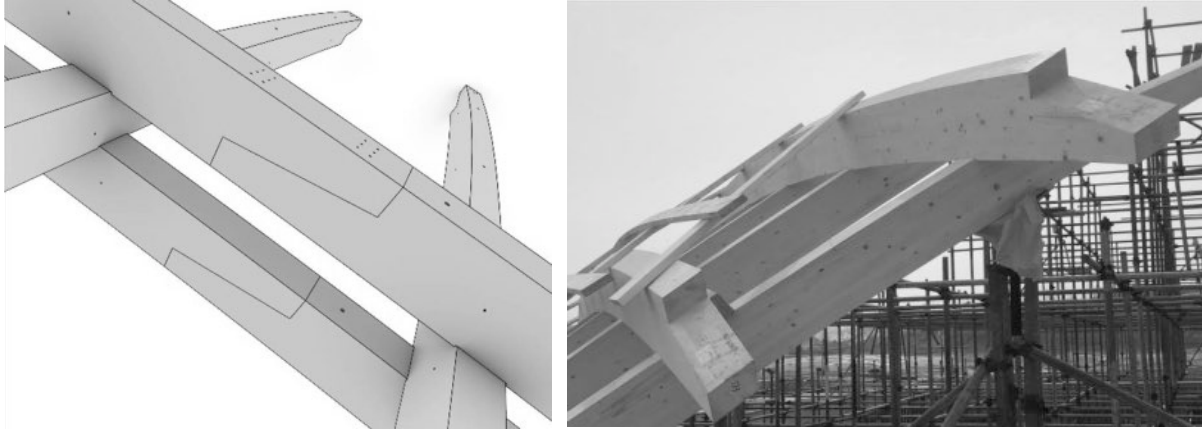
Half-lap splice structural details at end of a prefabricated panel
